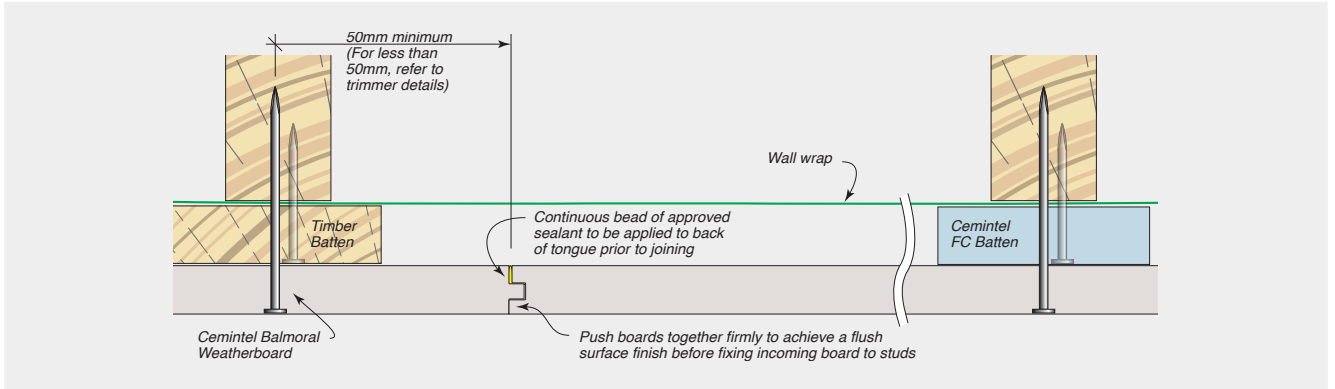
Typical Vertical Joint Aligned to Timber Stud with Local Trimmer
